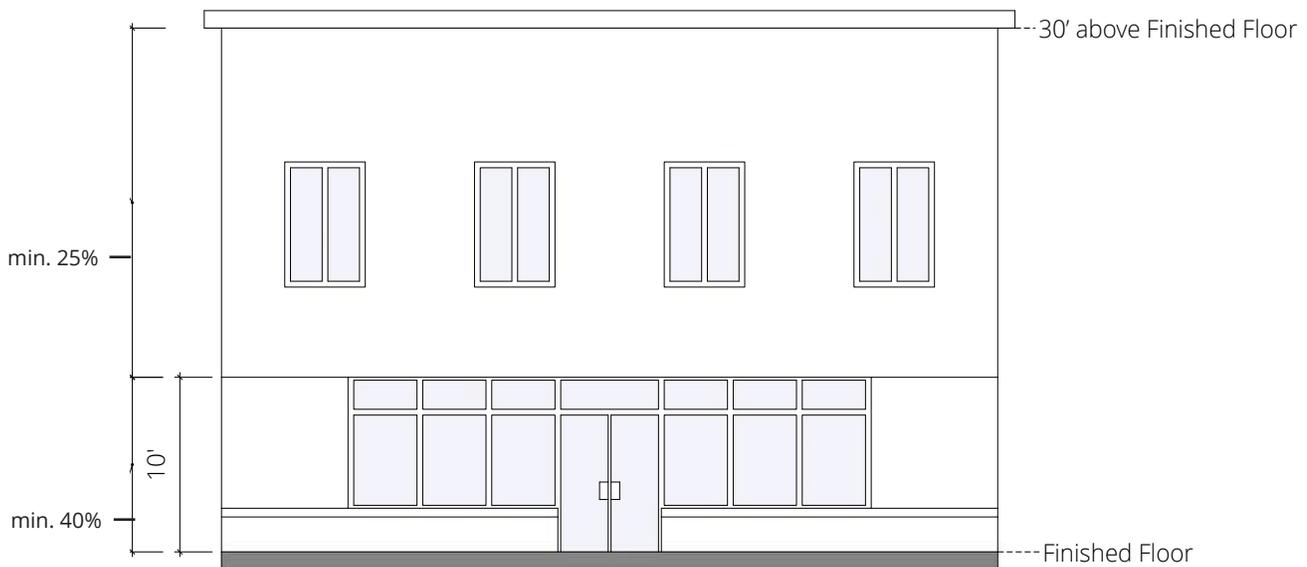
E-8030(1) Glazing and Building Facade Relief Requirements
